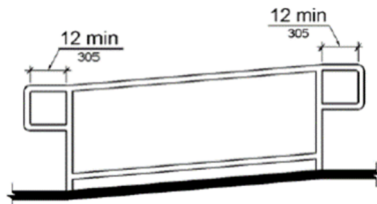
Top and Bottom Handrail Extension at Ramps
